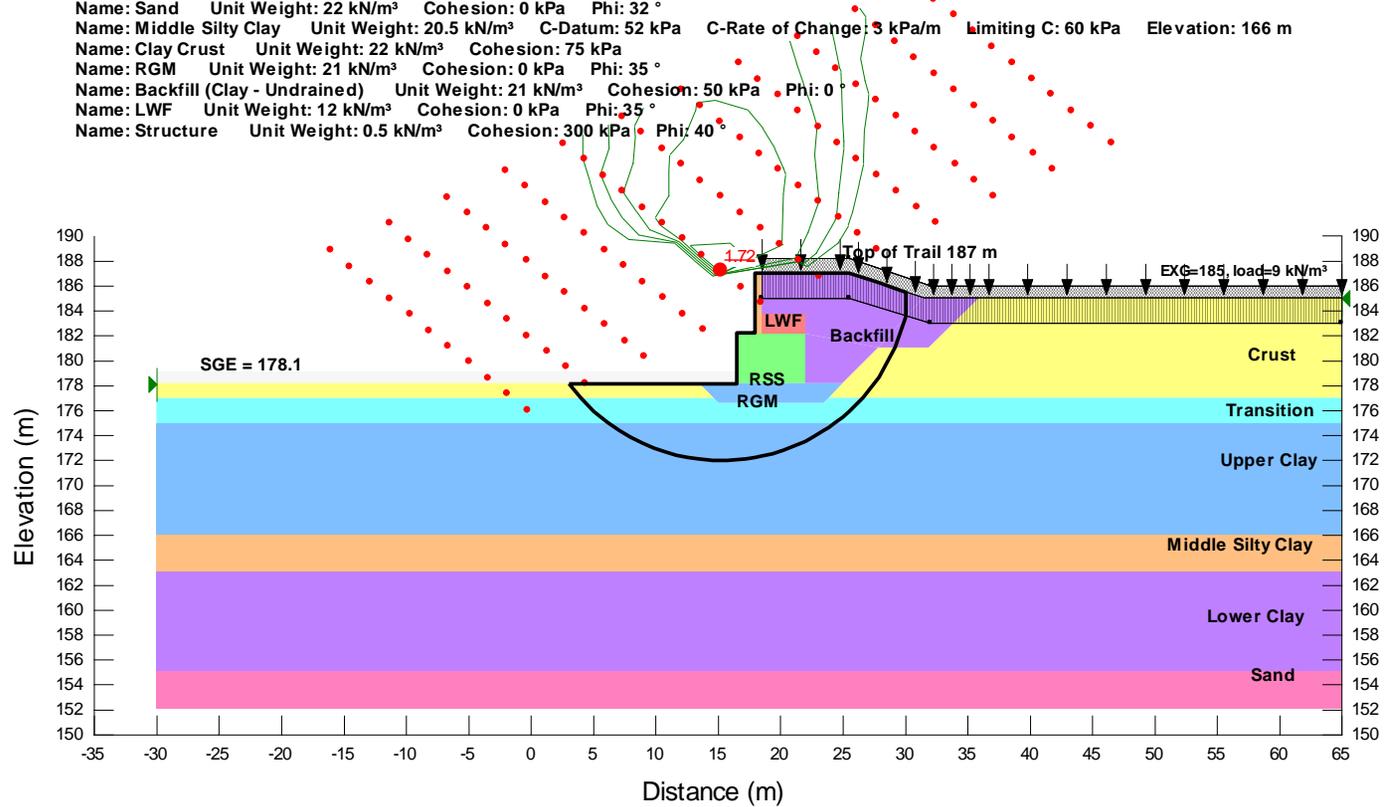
Global Stability Result – North Abutment Sta. 40+915 – End of Construction Loading (Undrained properties)
